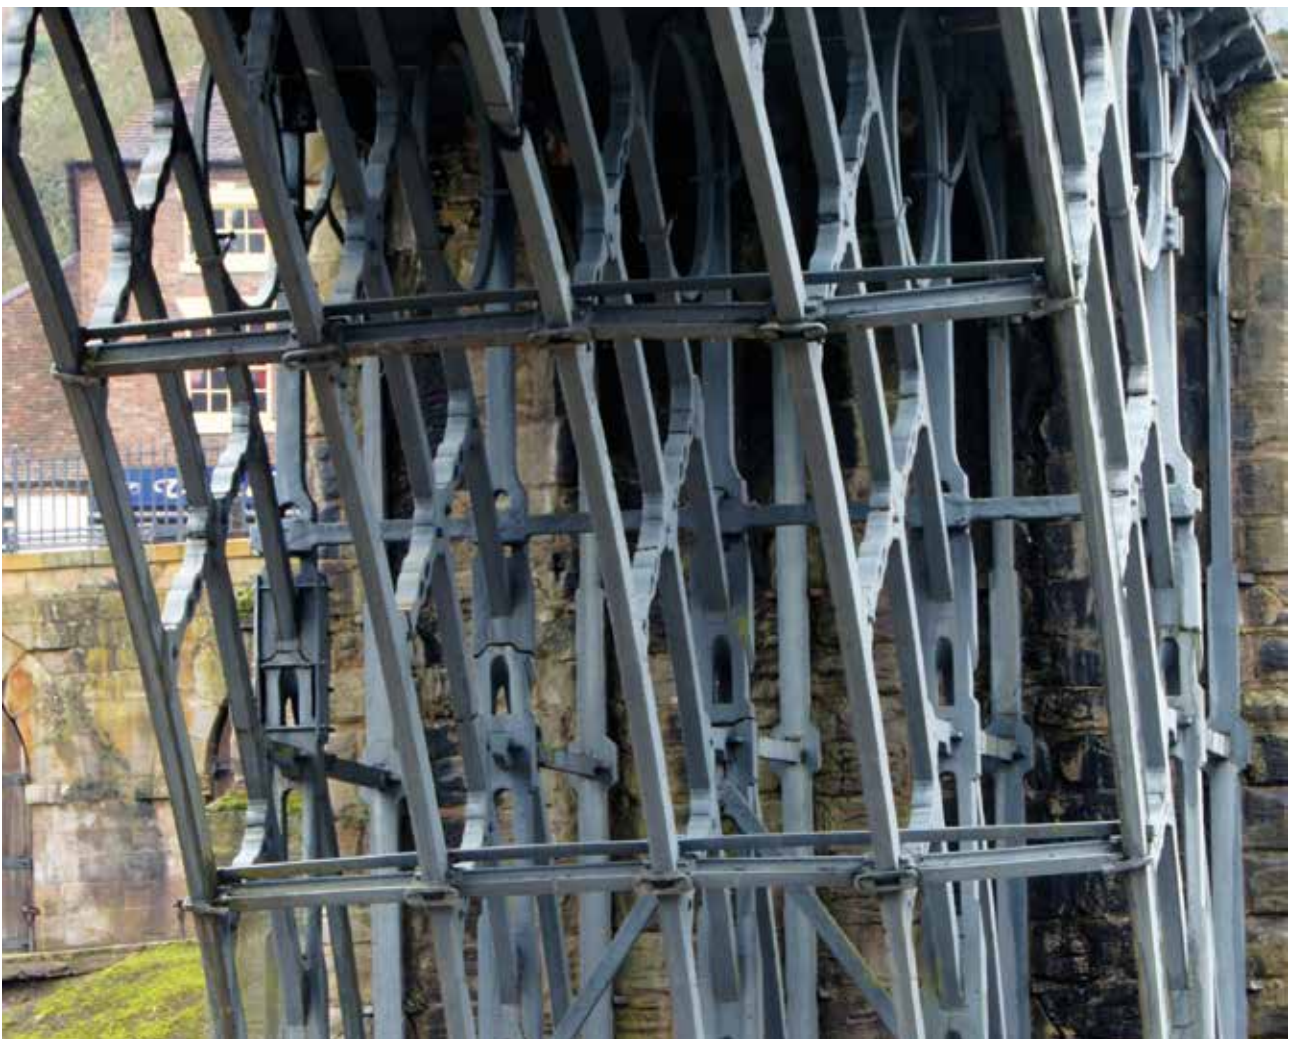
North bank rib bracing showing original cast iron spacers and 1926 steel straps
